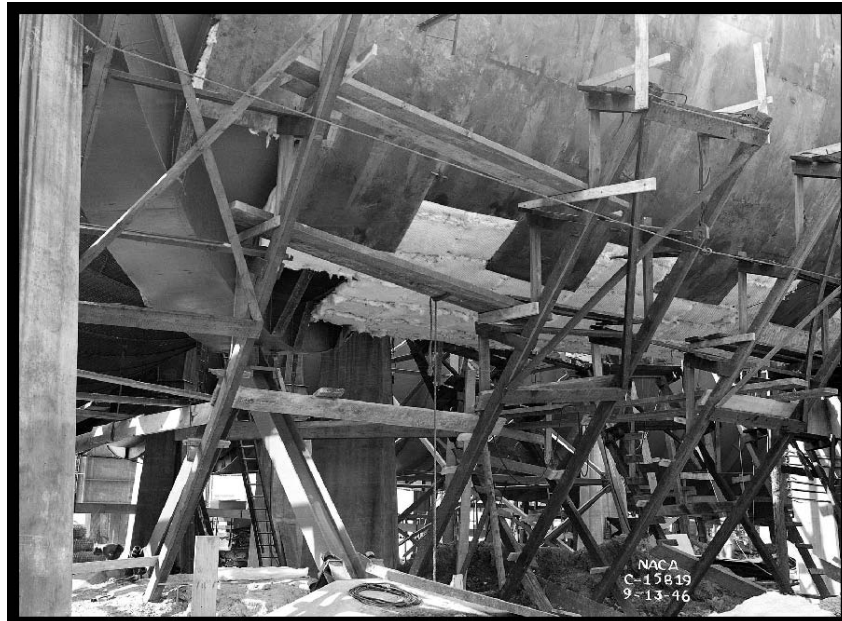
Application of fiberglass insulation and protective plate covering to the right of girder A, 1943 (OH_Cuyahoga_Altitude-Wind-Tunnel_019).
